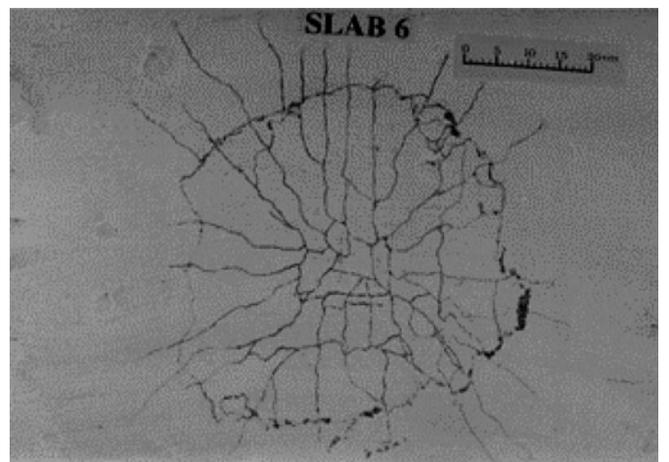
Typical cracking pattern on the bottom surface of a model slab
